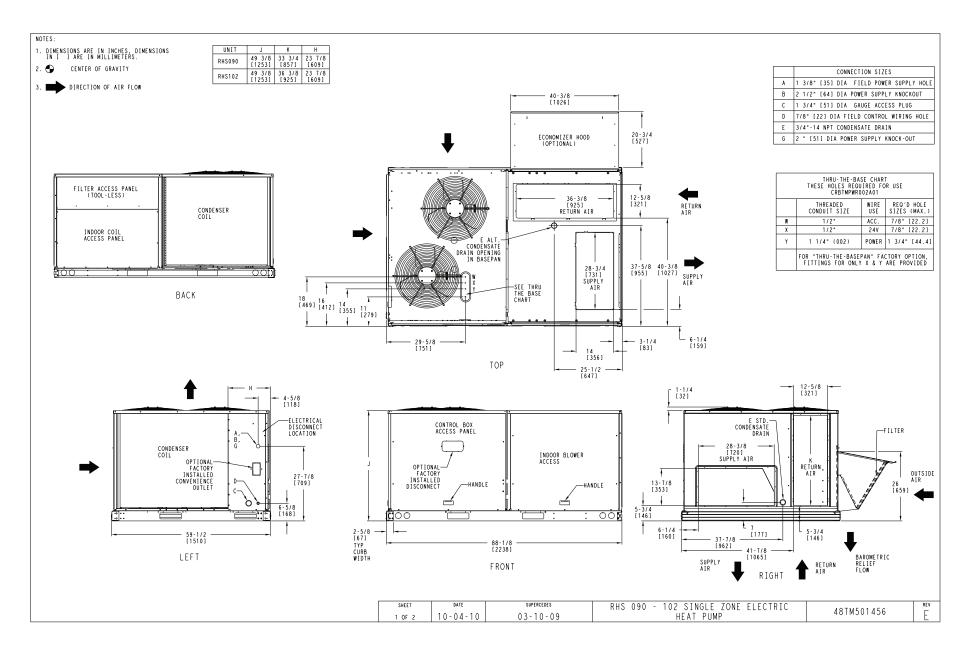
Unit Dimensional Drawing – 090 and 102 Size Units
